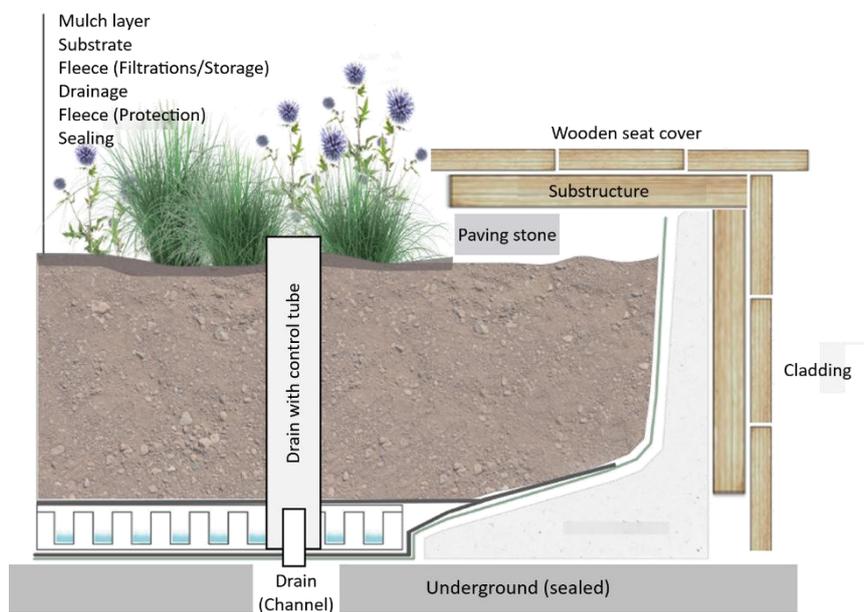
Construction of dense planting area as pop-up with concrete corner stones and wooden seat support
